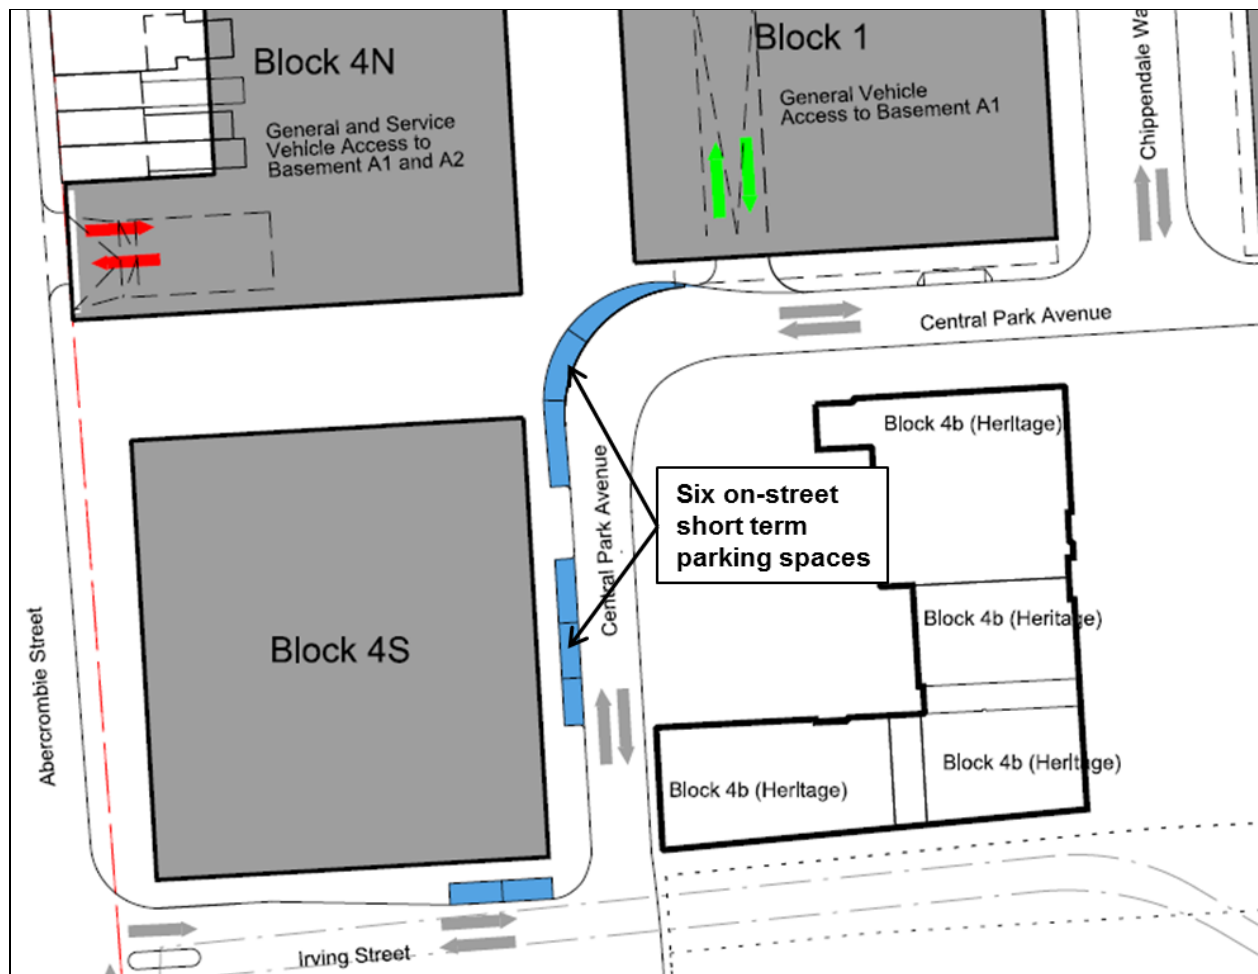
The location of the proposed short term car parking (Base source: MP06_0171 MOD9 and applicant's RtS)
